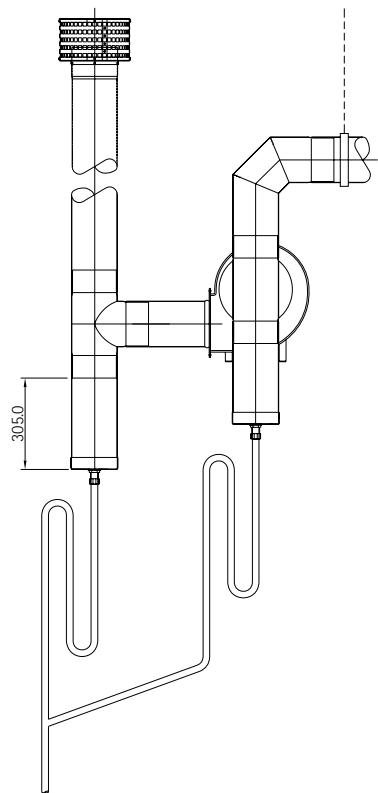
Type 'O' Fan Outlet Dimensions
